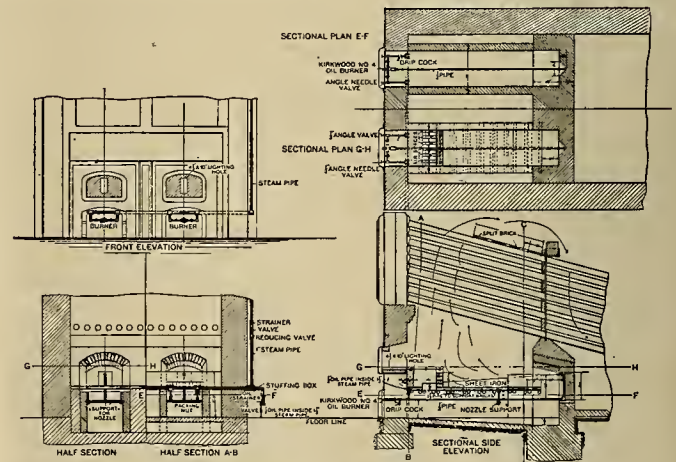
Setting for No. 4 Kirkwood Burner Under Water Tube Boilers.
